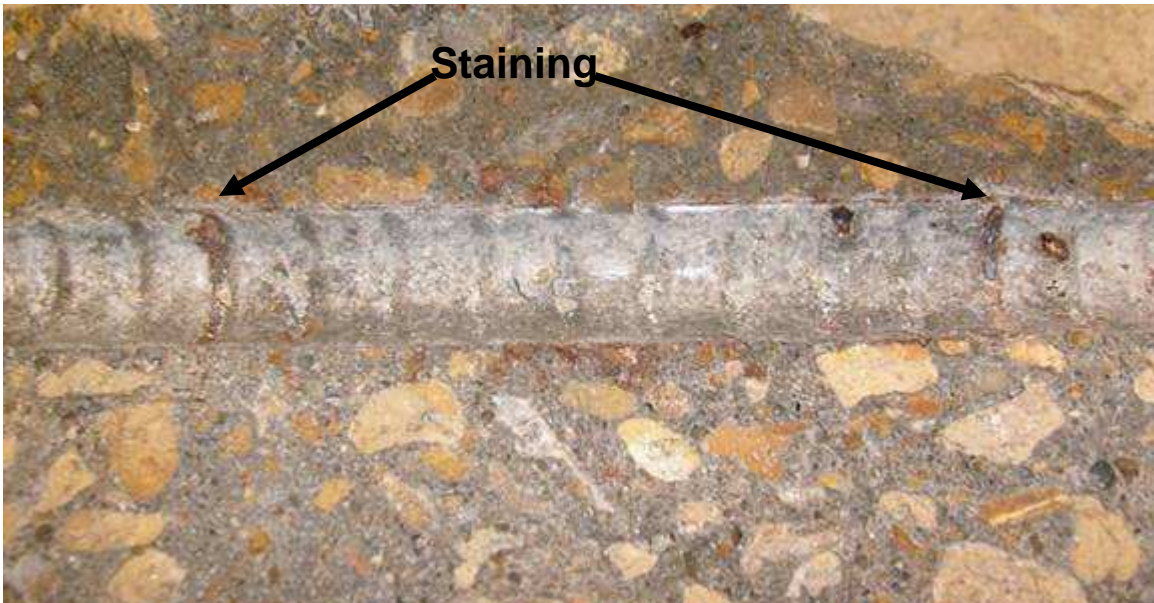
Concrete surrounding test bar from specimen 2r-H-2.
